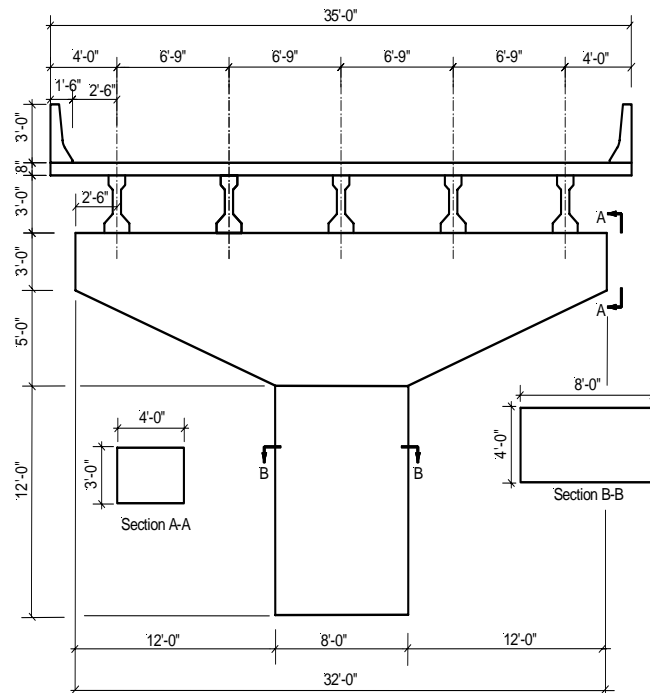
Hammerhead Bridge Cross Section at the Pier
